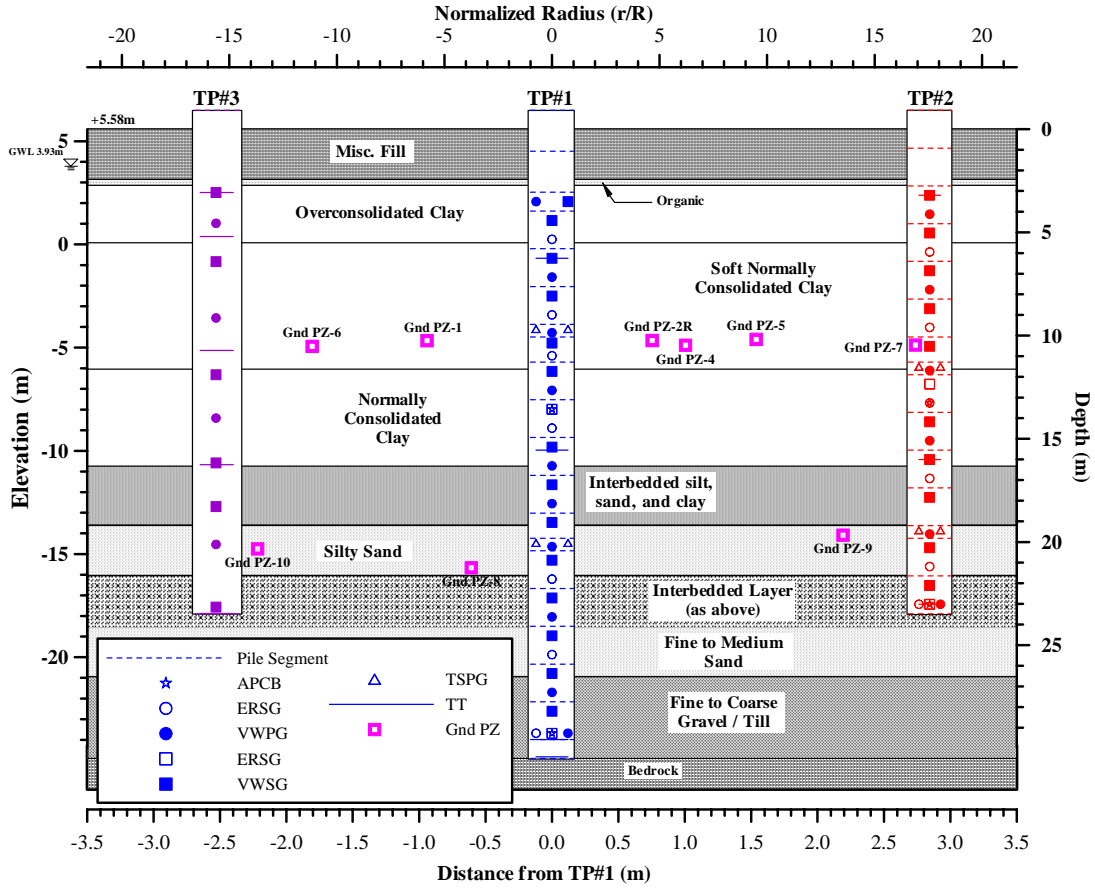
Newbury Site Soil Profile with Test Pile Layouts.
